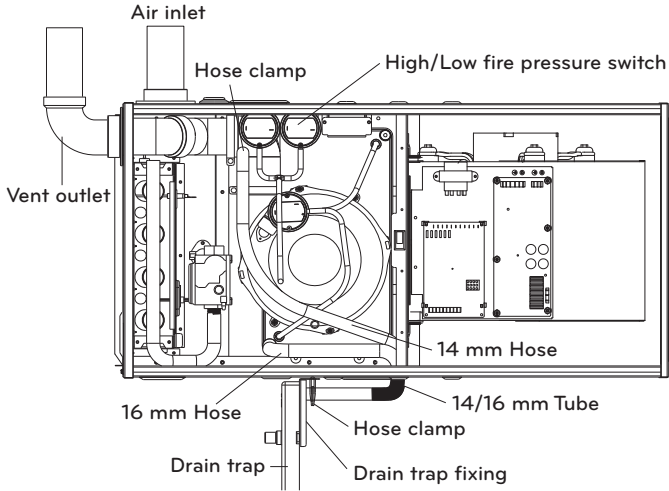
Horizontal Left Side Installation, Vent Through Top Panel
